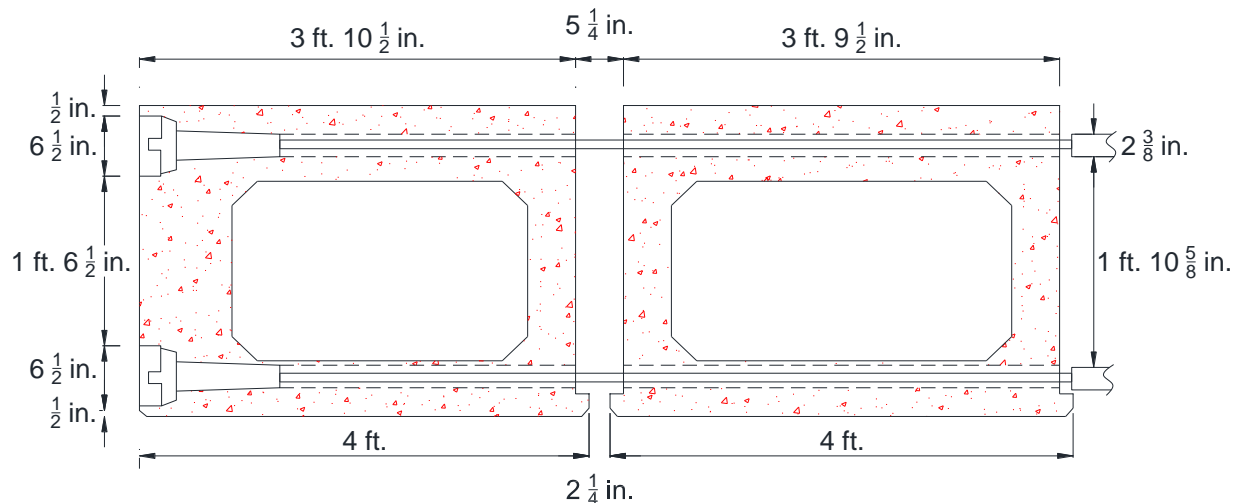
Transverse connection detail of The St. Clair bridge, Michigan (Sun et al. 2018)
